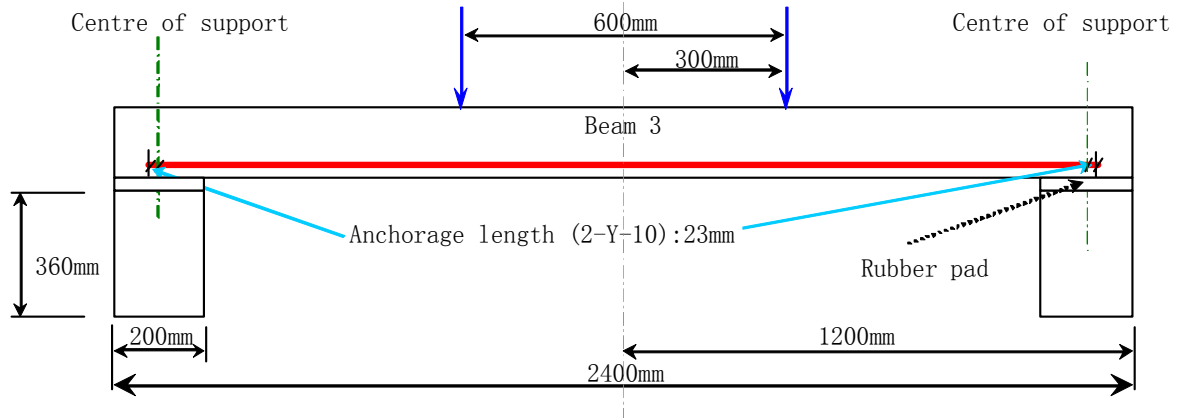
Sketch for end anchorage length of tension reinforcement and support conditions for beam 3.
